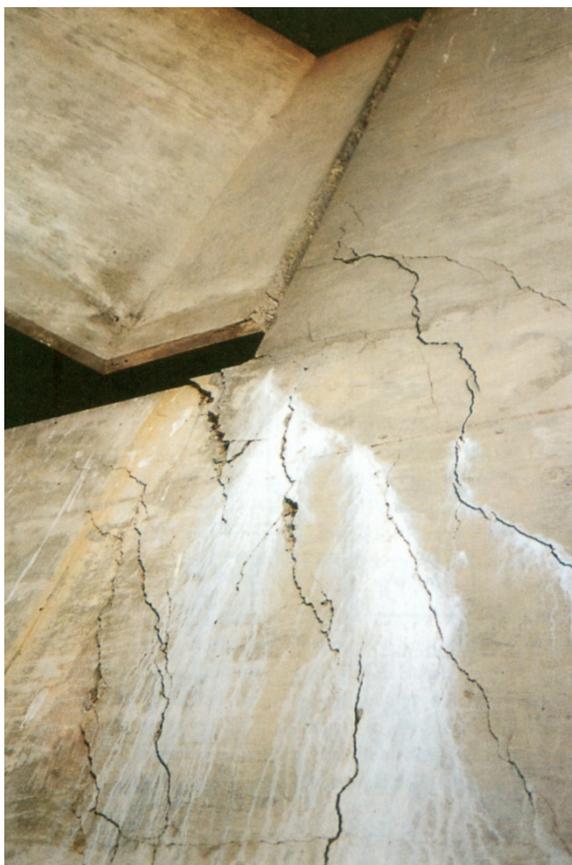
Cracking in the abutment wall near an acute corner of the superstructure for the bridge shown in Figure B.2. (Nicholson et al. 1997)
